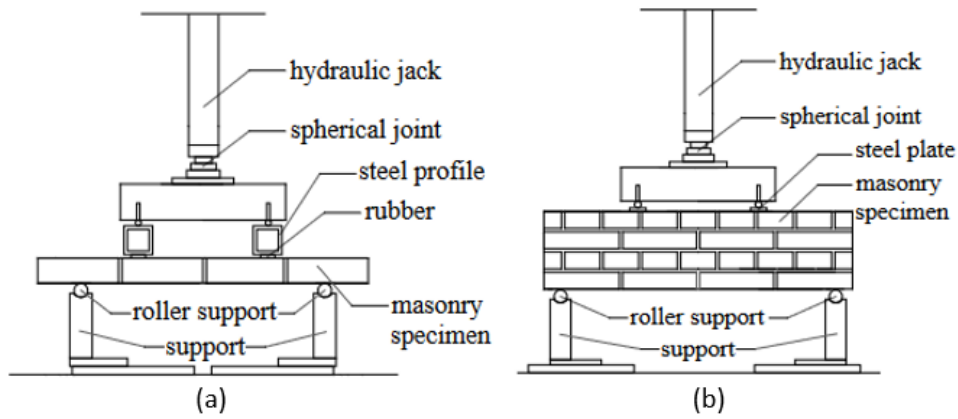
Four-point bending tests on CS masonry (a) OOP bending test with a plane of failure perpendicular to the bed joints (b) in-plane bending test (Esposito et al., 2016)
